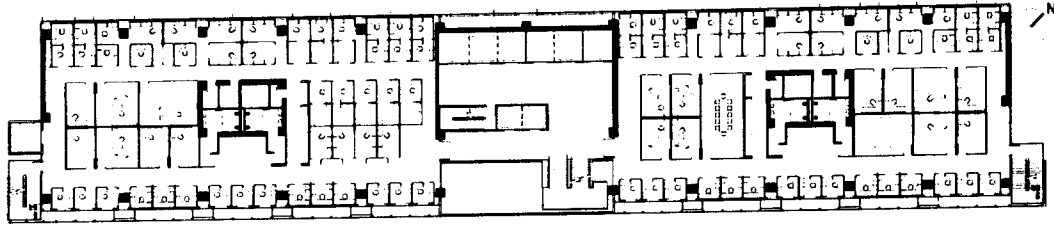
Plan of a typical floor. The building is 122 m long and 19 m wide
